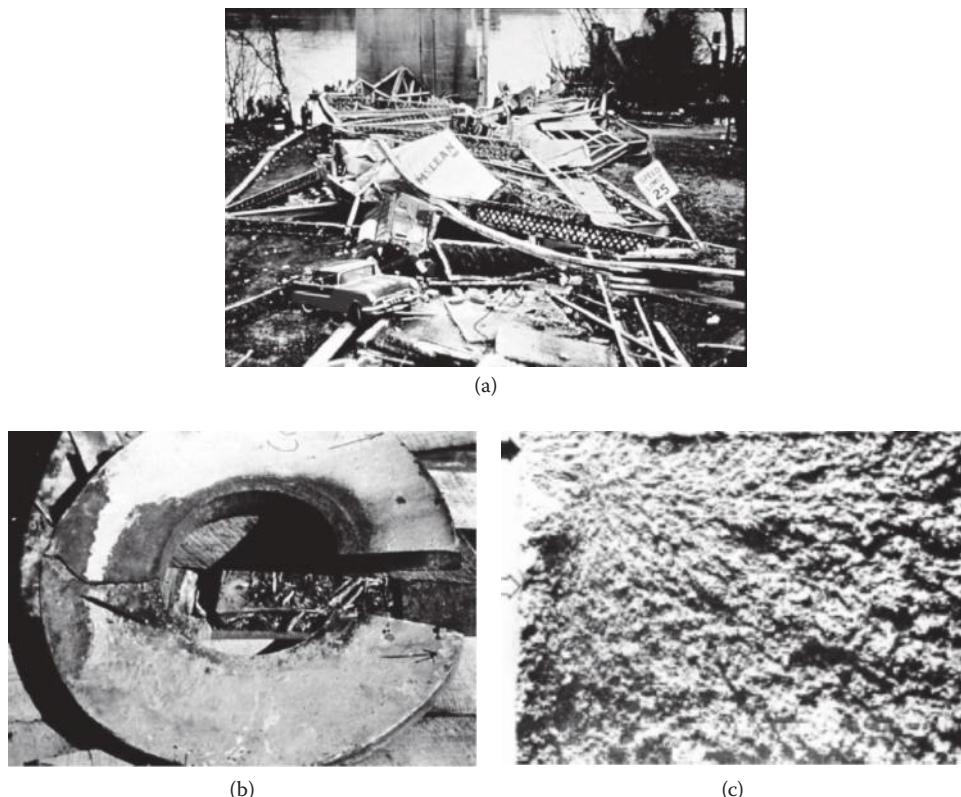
Silver bridge collapse due to eyebar failure: (a) collapsed bridge, (b) cracked eyebar, (c) fractured section. (Courtesy of FHWA, 1970.)
